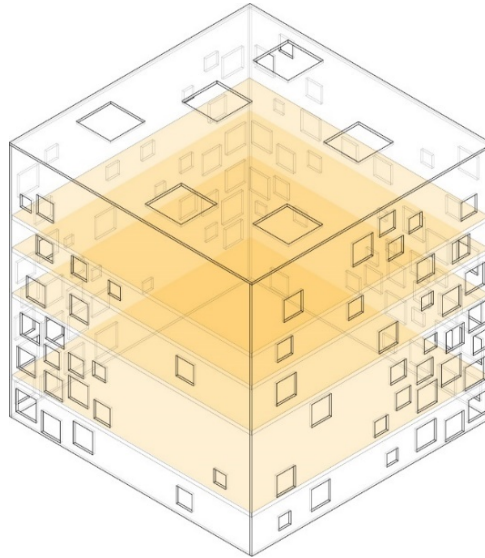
Diagram showing the internal floorplates of the Zollverein School
